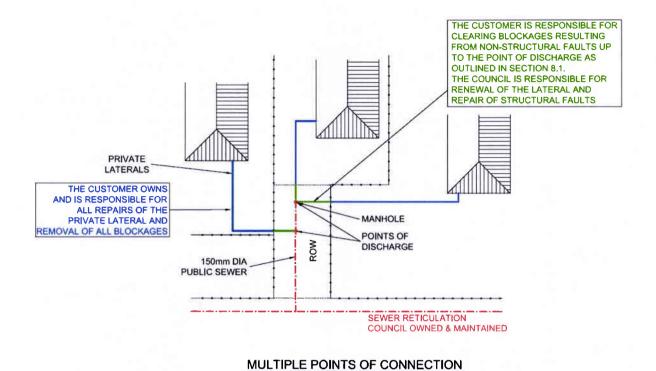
Multiple connections to a Public Sewer in a Private Right of Way – Easement required
